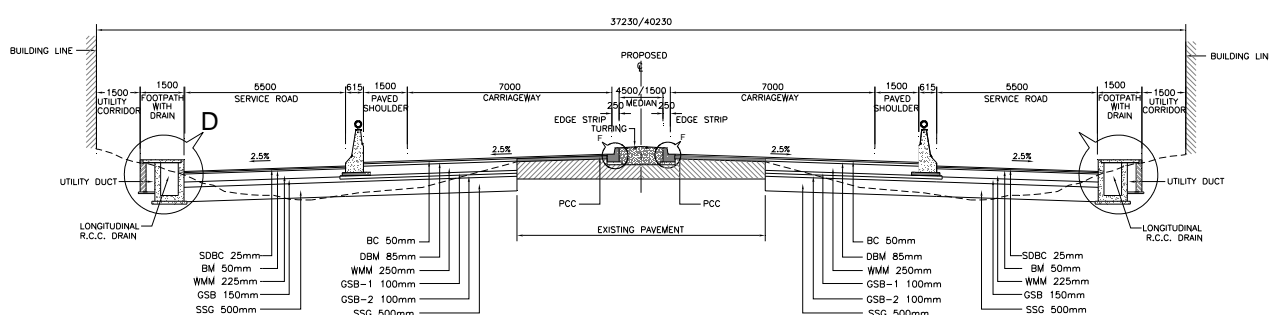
TYPICAL CROSS SECTION FOR CONCENTRIC WIDENING AT MAJOR URBAN AREA FOR RESTRICTED ROW
